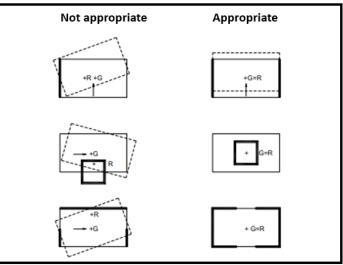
The situation of Structures with Shear Walls in terms of Earthquake Affect Behavior in the Building Plan
